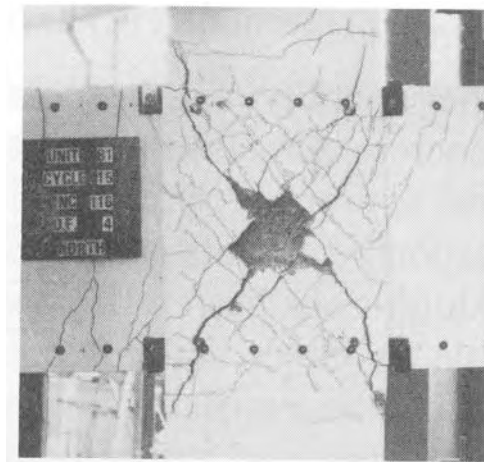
Crack pattern of a joint (Paulay and Priestley, 1992)
